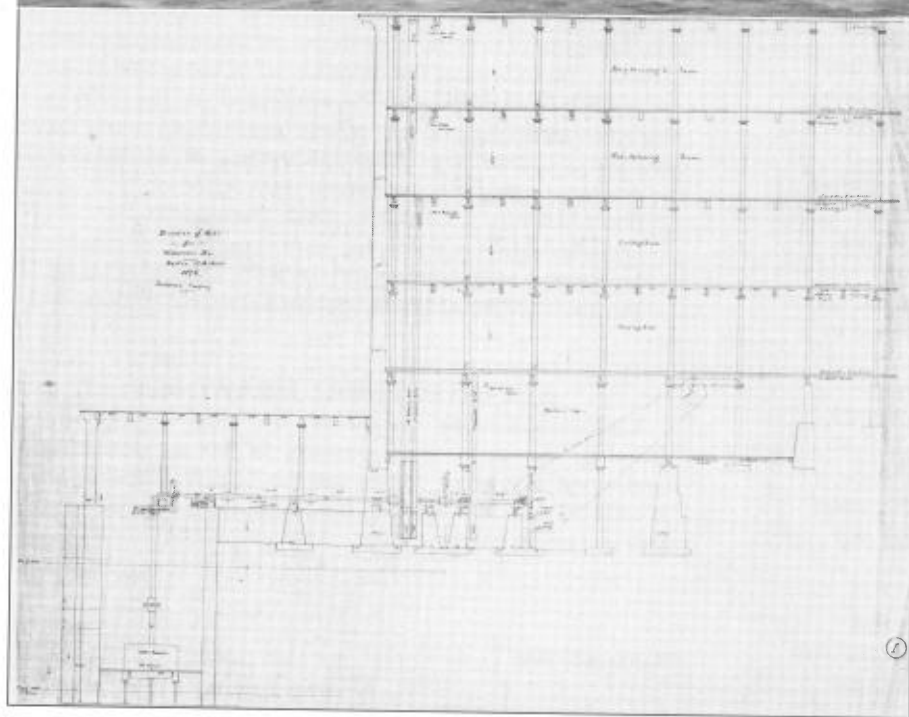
Cross section drawing of the Lockwood Mills, Waterville (Courtesy of Lockwood-Greene Engineers, Inc.)
